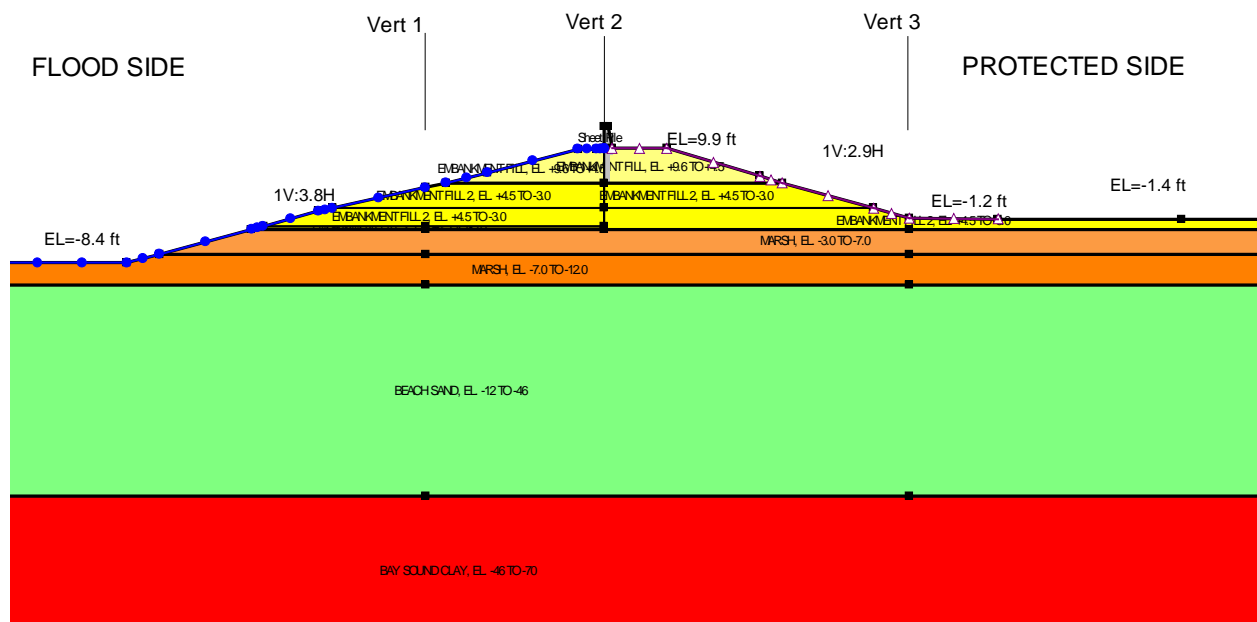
Geo-Studio model for 17th Street Outfall Canal Reach 17
